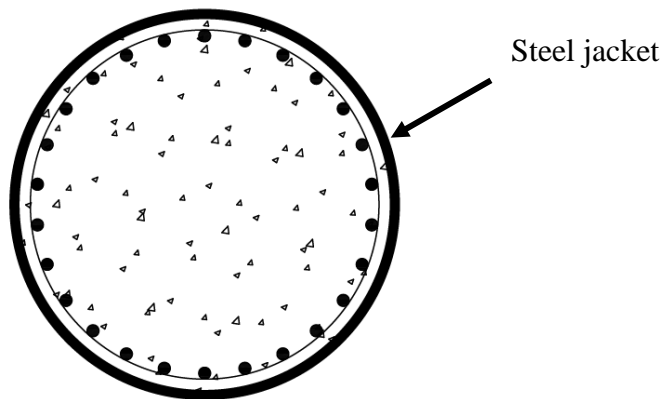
Steel jacket retrofit on circular reinforced concrete columns
